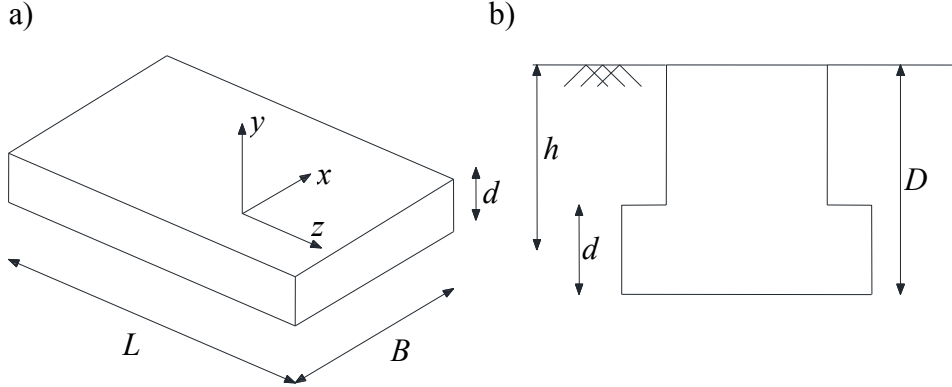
a) Geometrical parameters and local reference system of the foundation, b) geometrical parameters describing foundation embedment.
